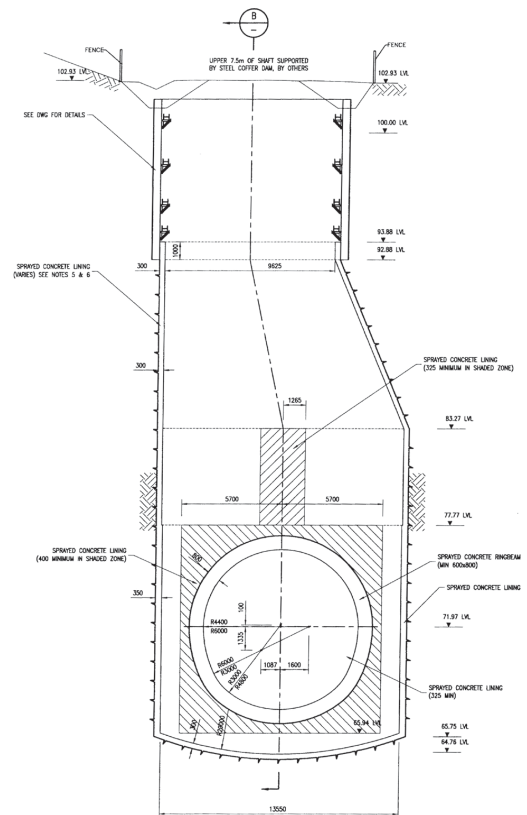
Shaft longitudinal section with shotcrete collar structure for TBM break-in.
